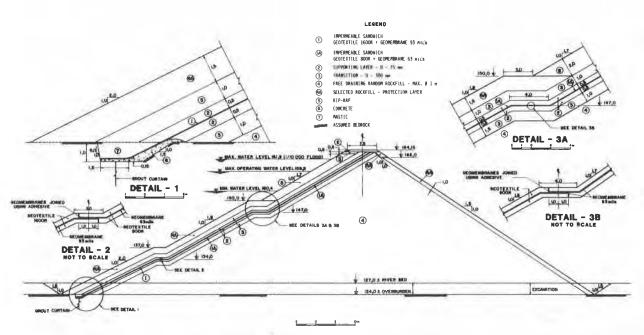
TYPICAL MAIN DAM CROSS SECTION (SECTION D-D)
